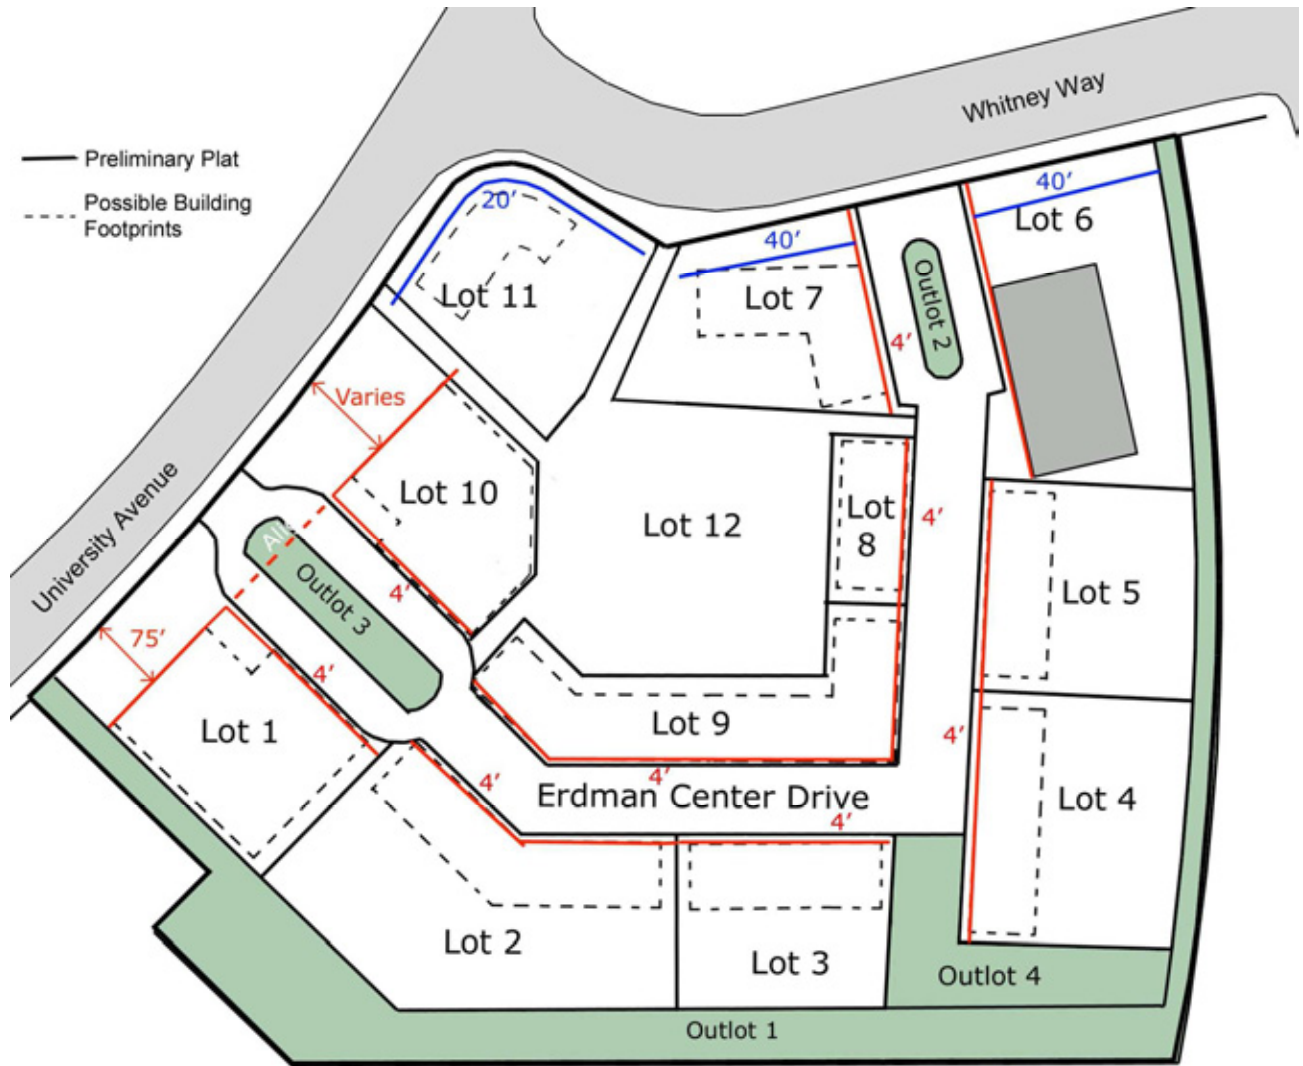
Build-To and Setback Lines governing position of building facades.
